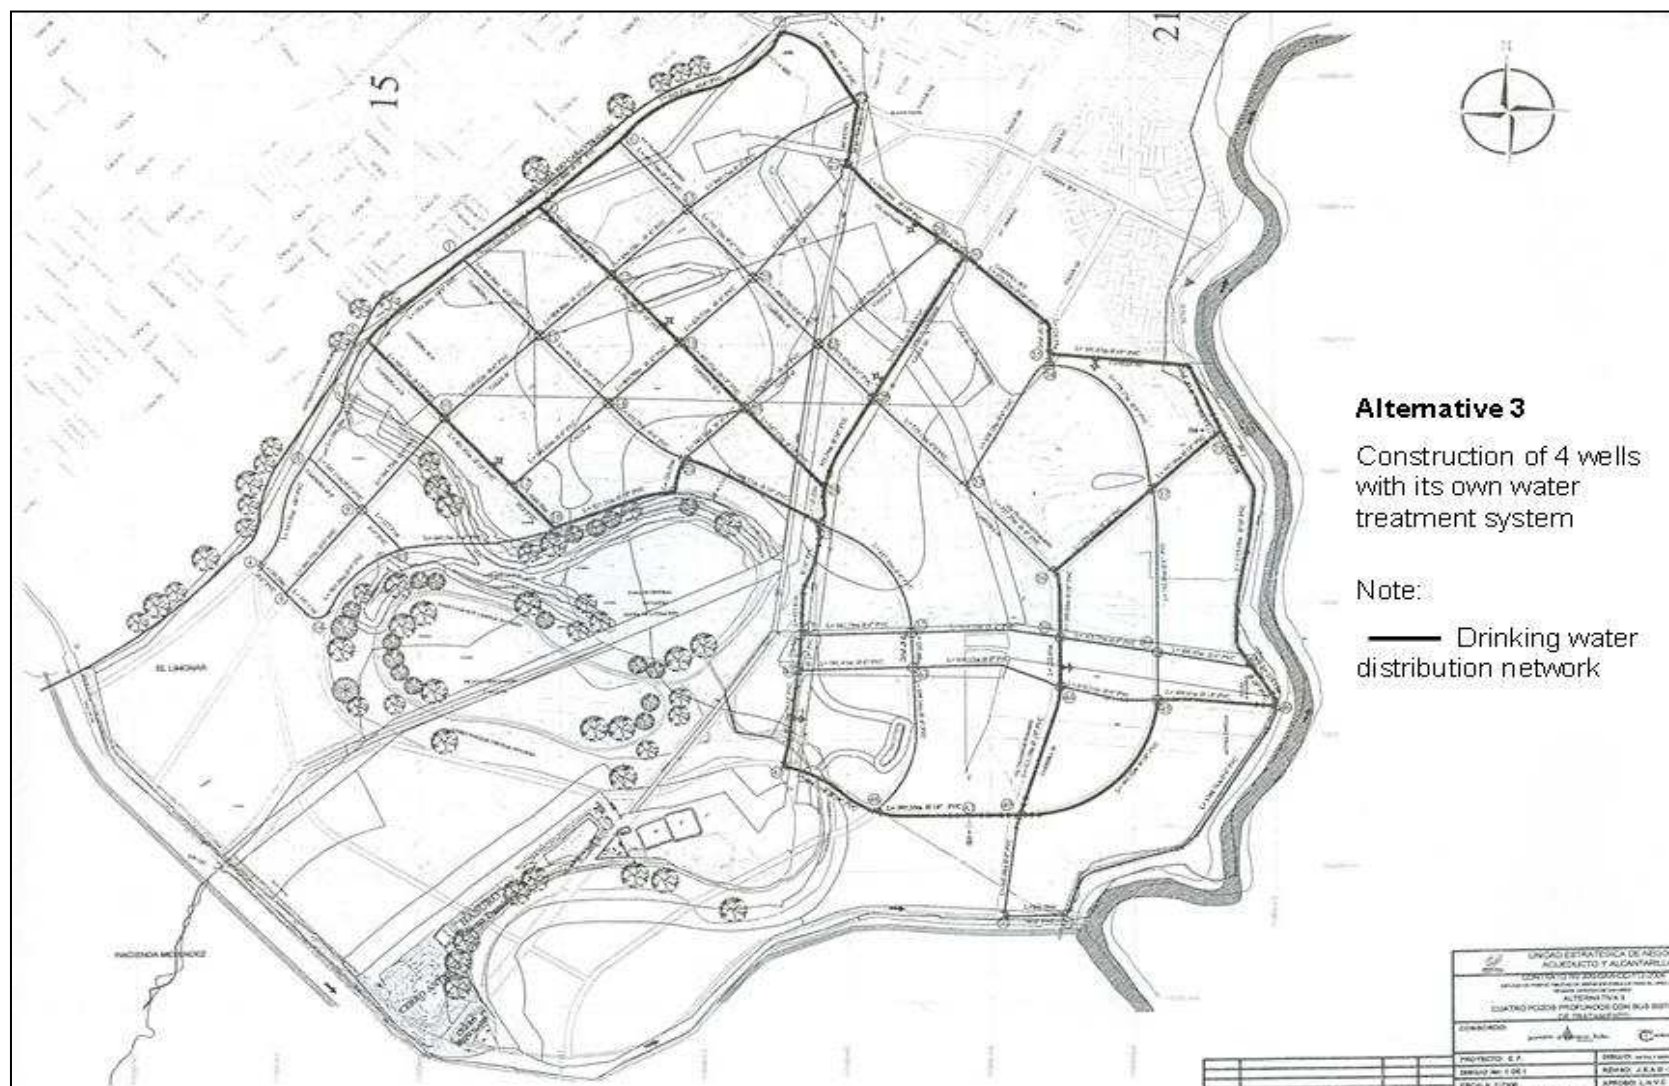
Alternative 3 - Construction of four wells located along drinking water network in Navarro Sector
